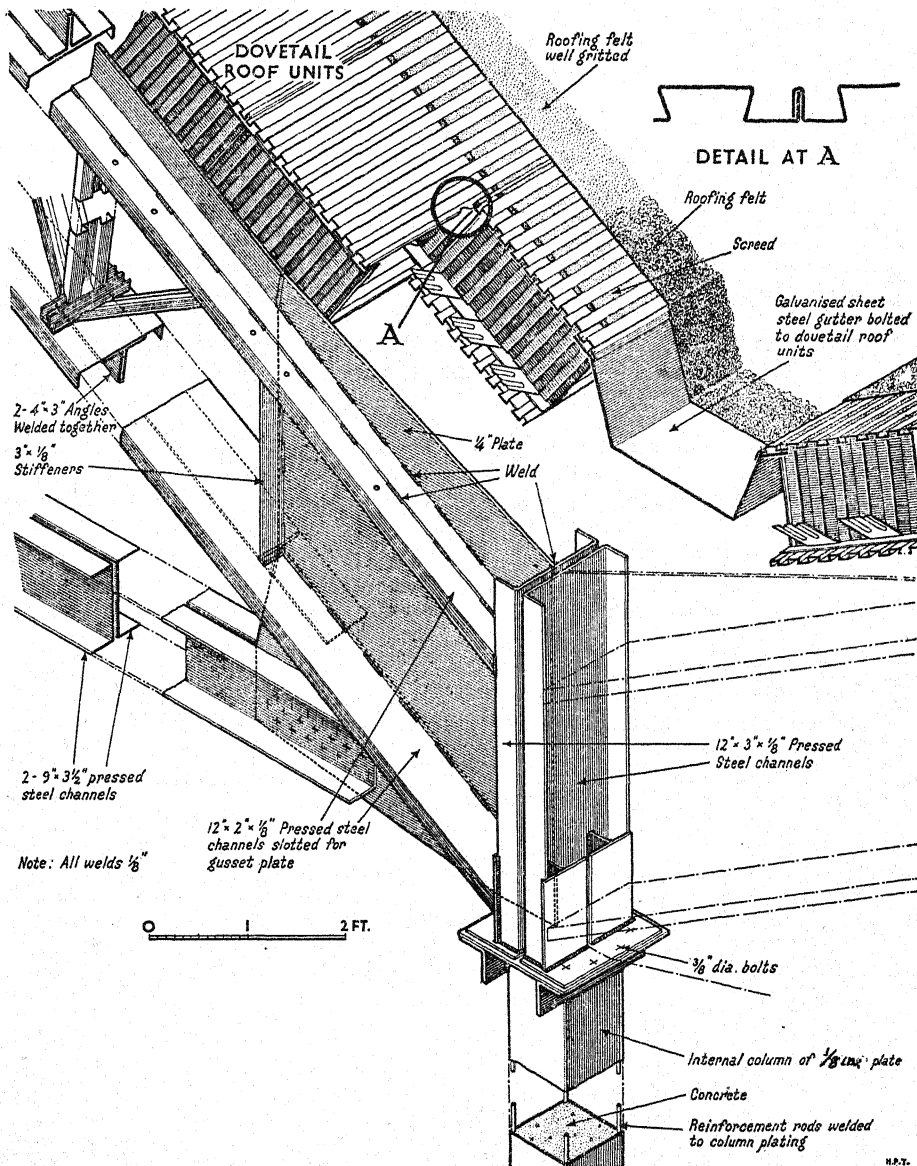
Isometric view of heel of arch truss showing constructional details.
